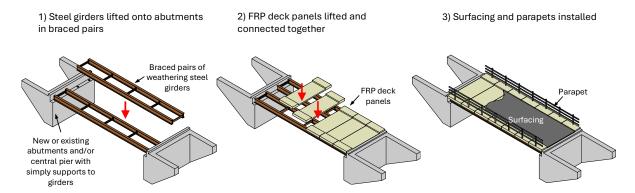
Proposed construction sequence for modular FRP deck bridge.
